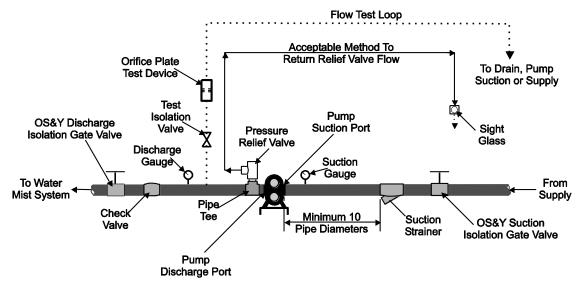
Typical Water Mist System Pump Piping and Fittings
